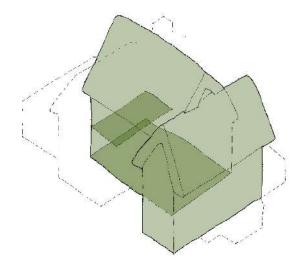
Original 16th/17C phase. Open hall showing section of first floor only at west end; with east crosswing.
